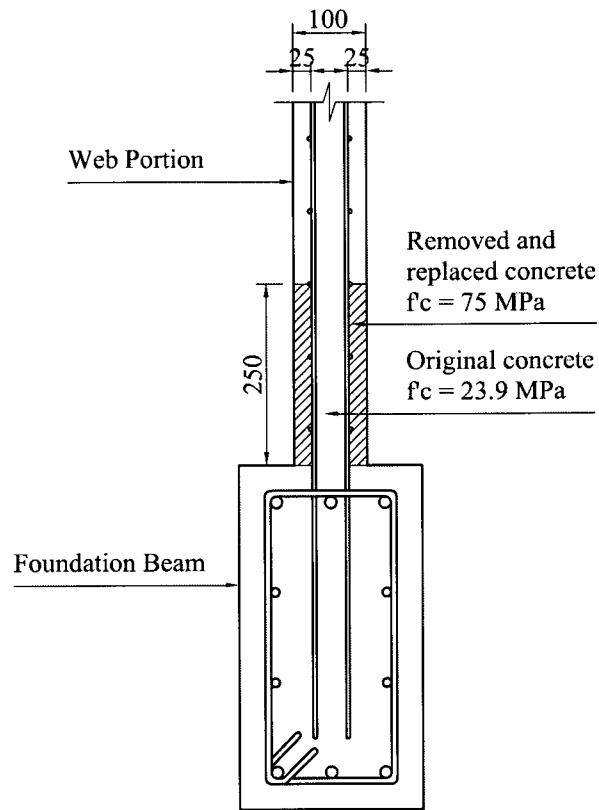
Partial Replacement of Concrete. All Dimensions in mm
